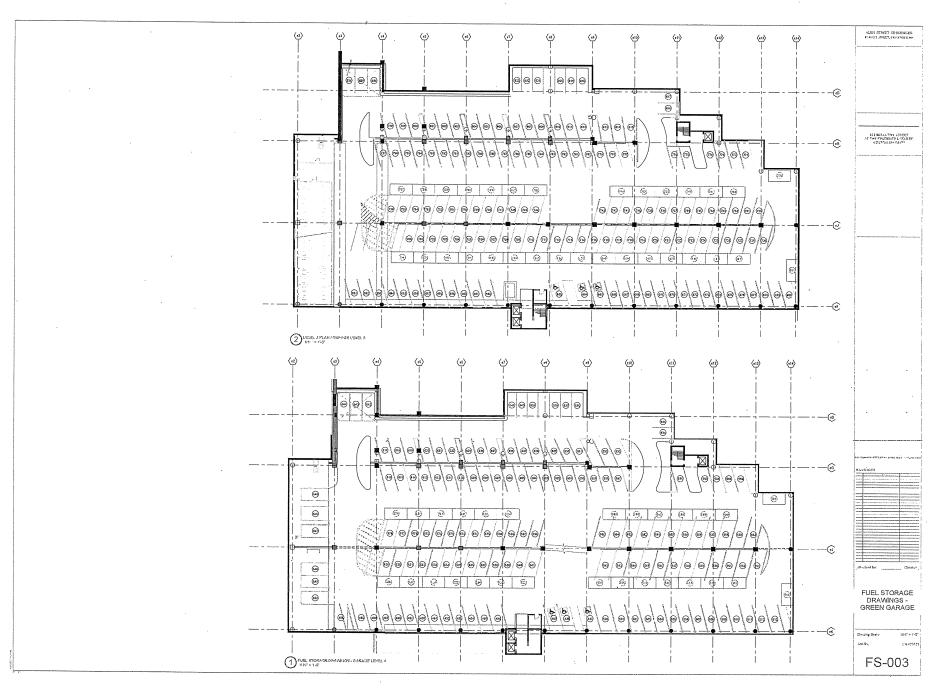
Proposed Layout Green Garage (824 Spaces)
